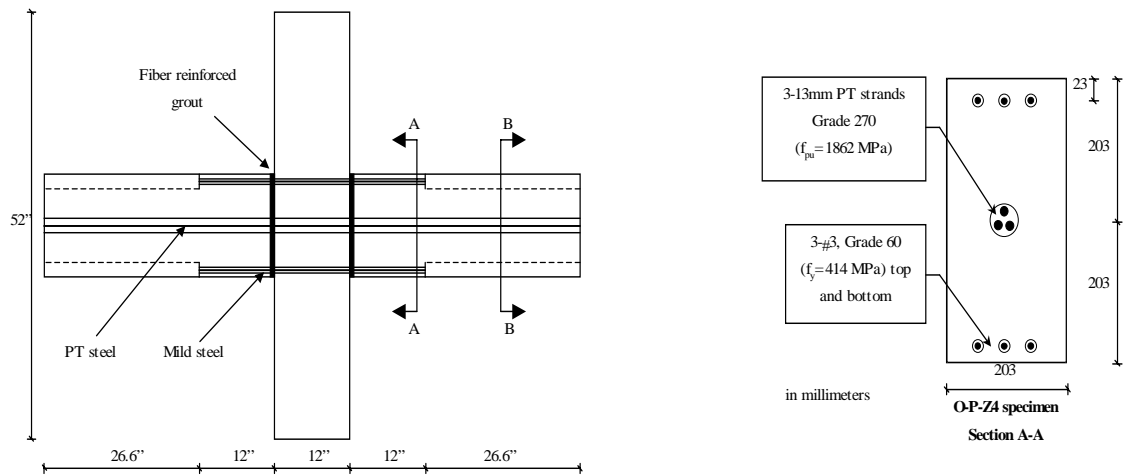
Specimen O-P-Z4 and beam section reinforcement details [2.8]
